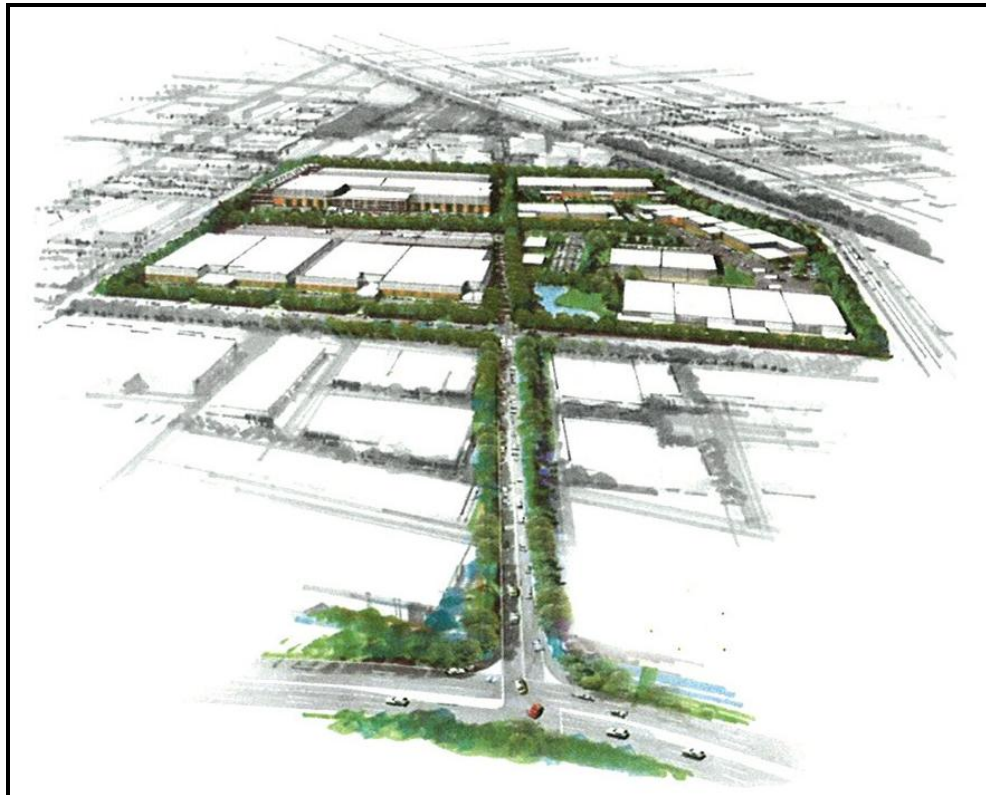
Aerial Perspective of Proposed Site Layout and Link Road
